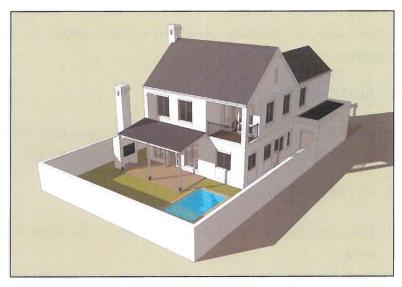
Covered stoep on private side of dwelling with 10° lean to roof.
